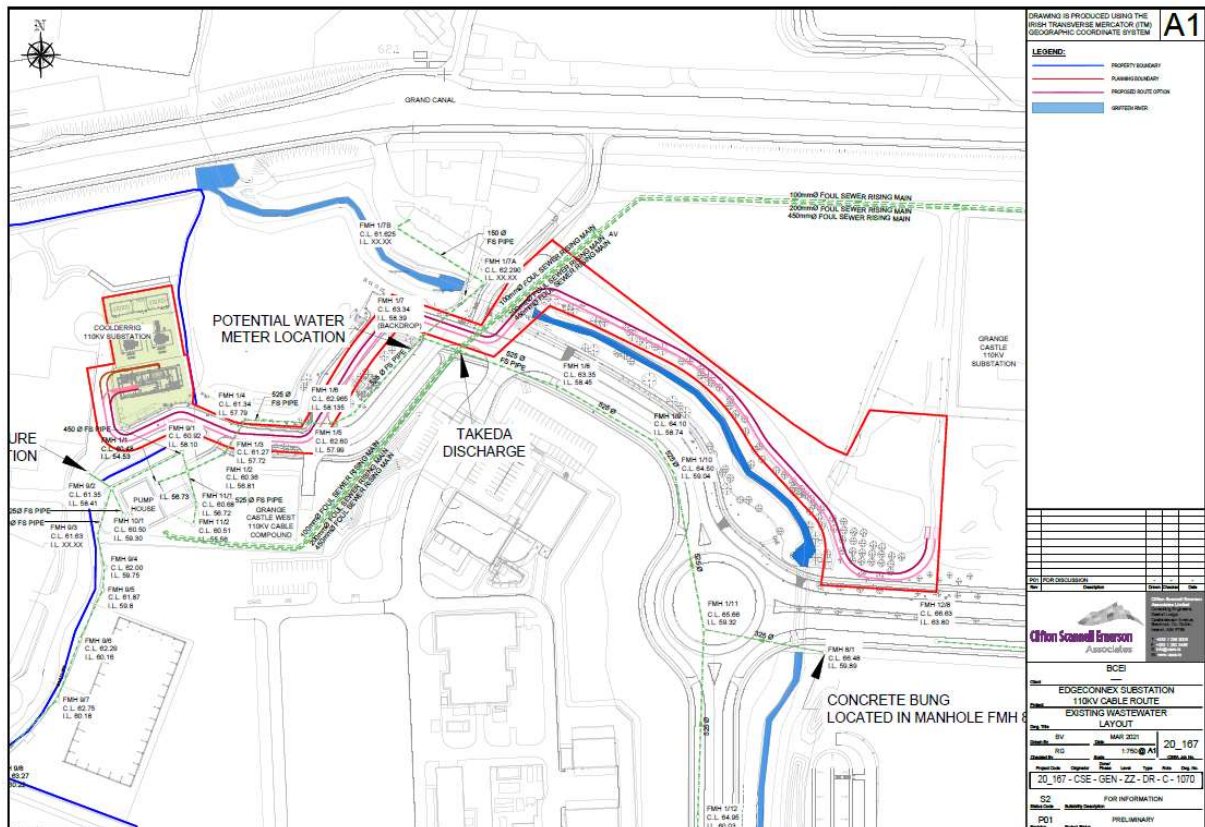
Overall Existing Foul Water Drainage Layout Plan DWG NO 20\_167-CSE-GEN-ZZ-DR-C-1070
